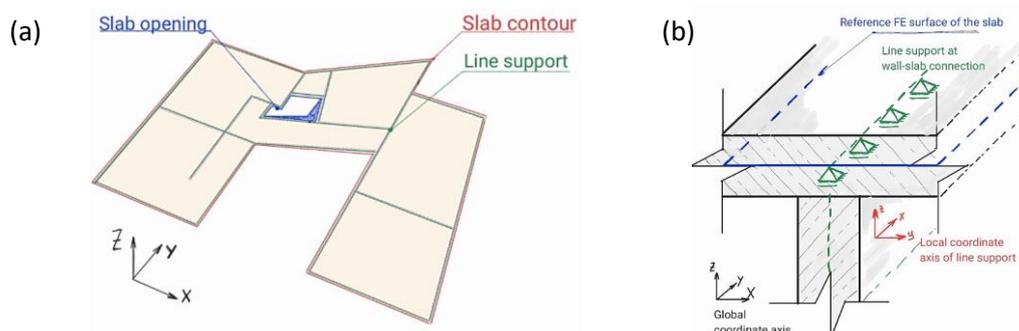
(a) Slab geometry with openings and line supports; (b) wall-slab connection.
